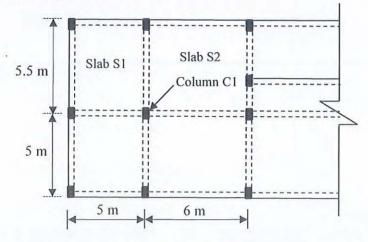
Floor Layout Plan of 9-Storeyed Nurse Institute
